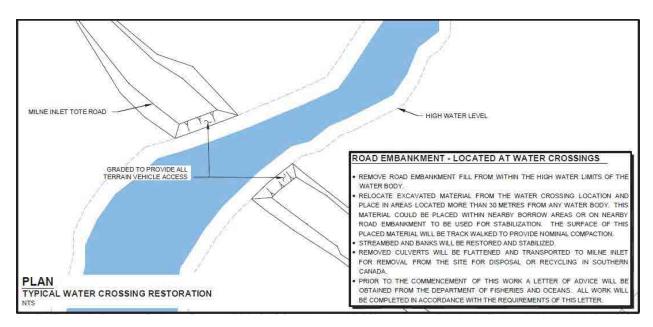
TYPICAL WATER CROSSING RESTORATION ALONG TOTE ROAD.
